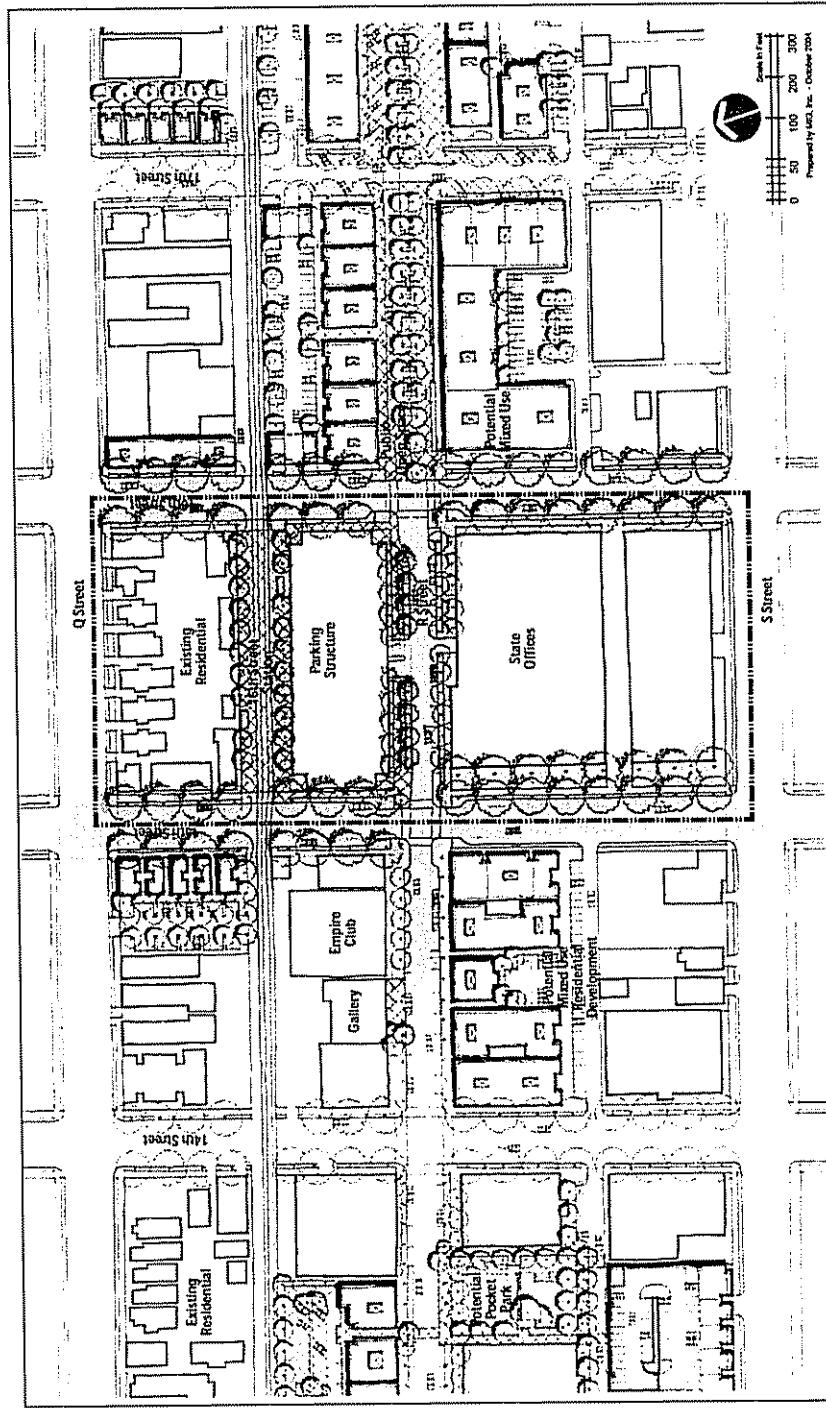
is a conceptual plan sketch of the possible implementation of the design concept and development plan.
